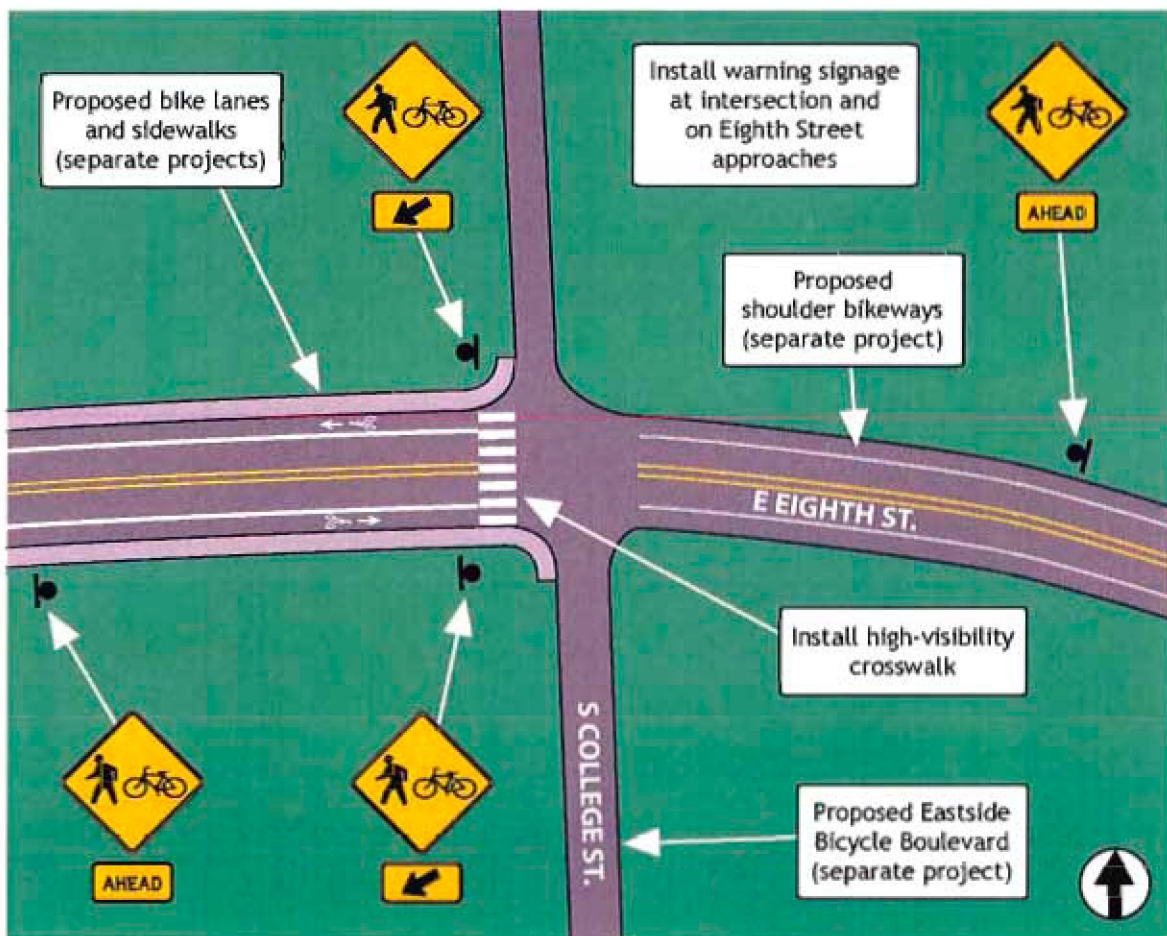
Proposed bicycle/pedestrian crossing improvements at E Eighth Street at S College Street.
